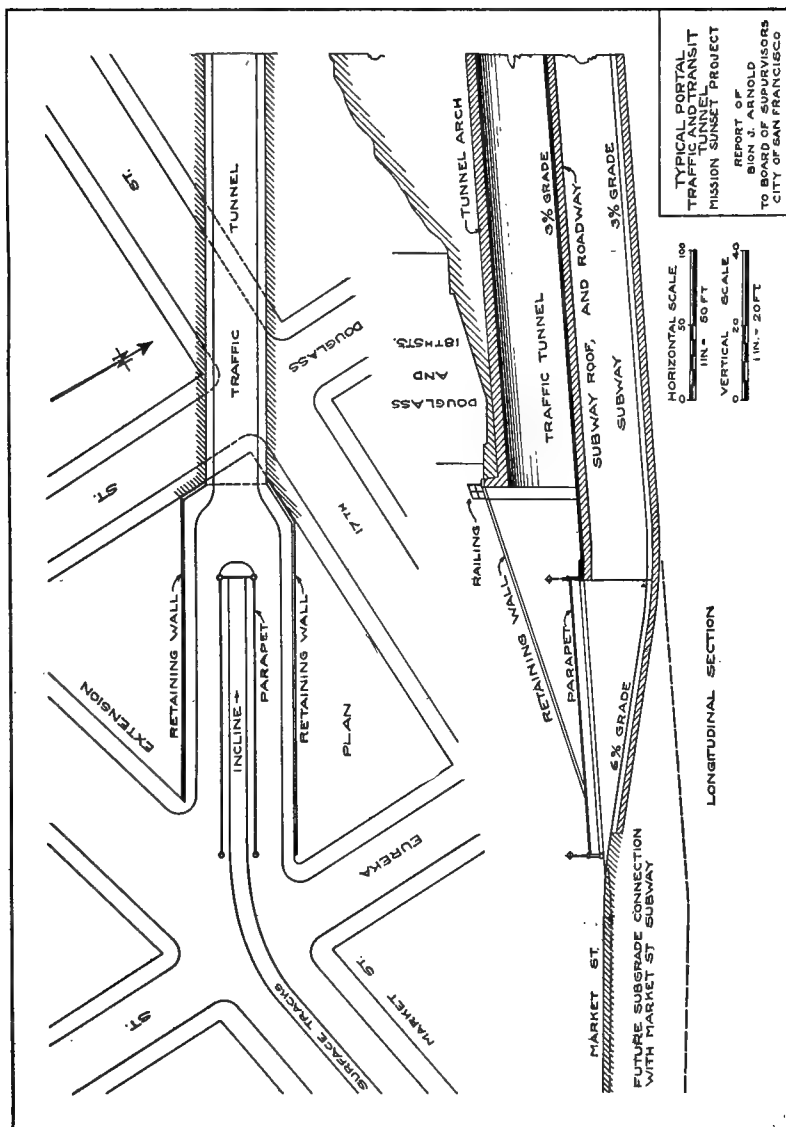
MISSION-SUNSET TUNNEL PORTAL.
